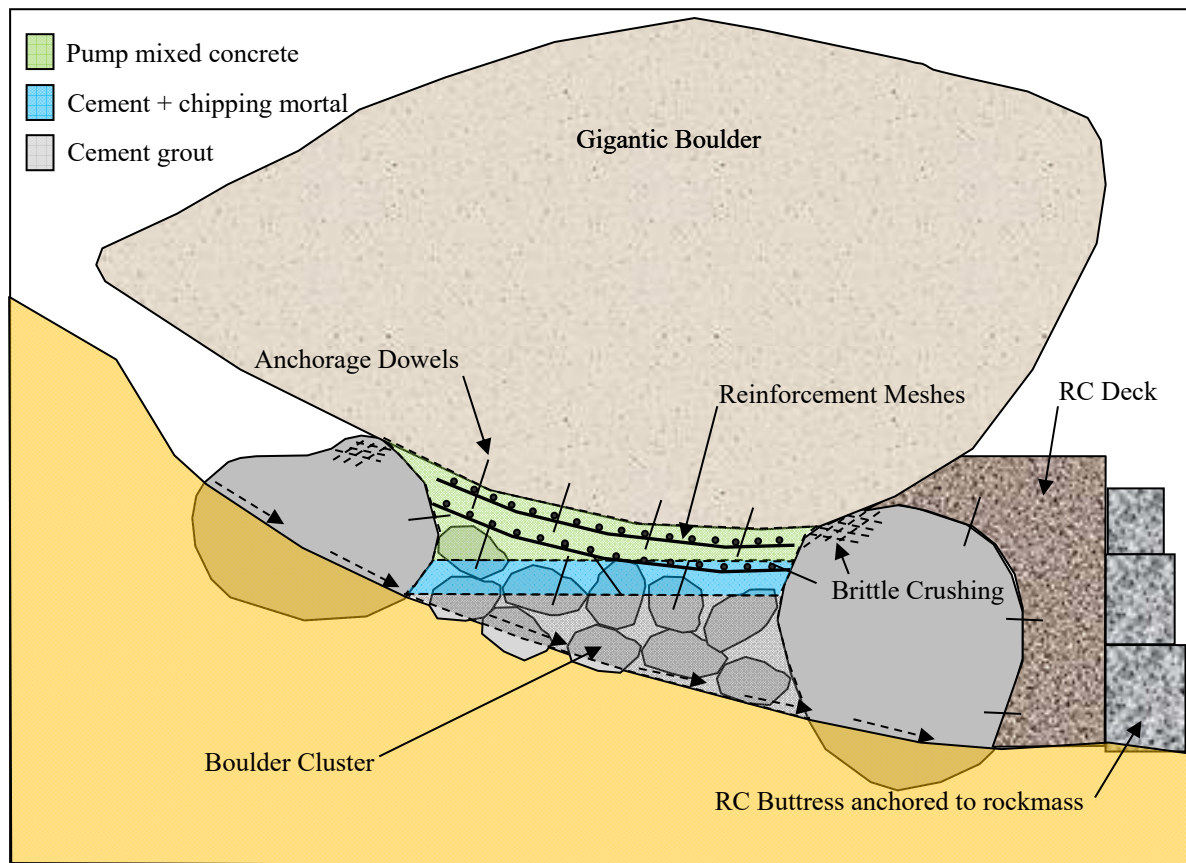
Reinforced concrete buttress abutting to huge diorite boulder
